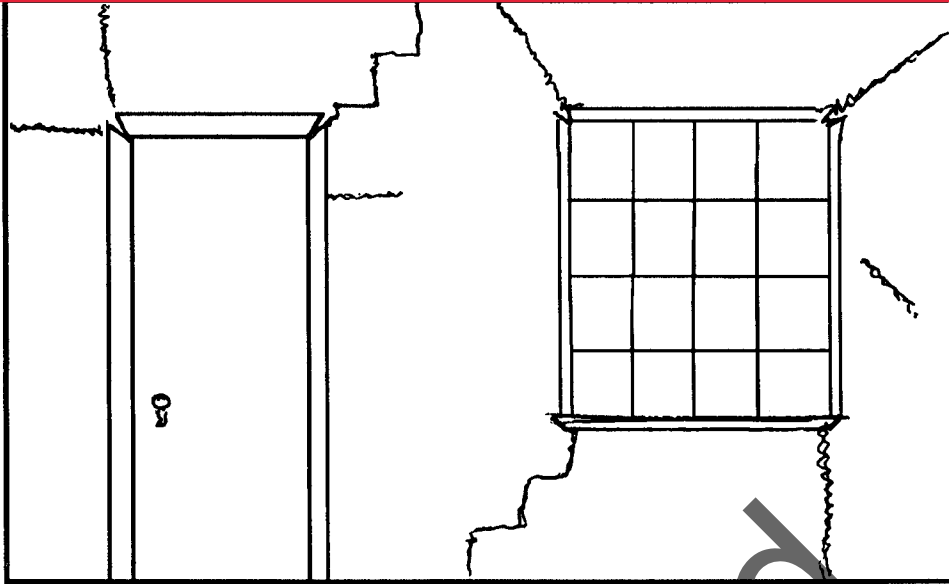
Sketch Of Typical Wall Crack Pattern.
